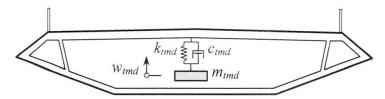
Cross section of bridge girder with a tuned mass damper, TMD
